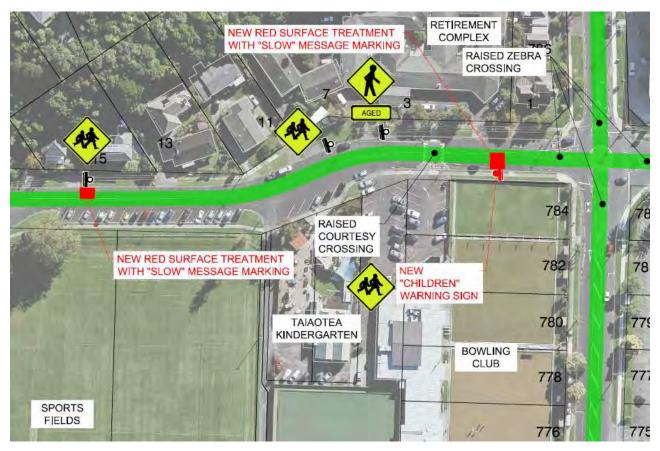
Taiaotea Kindergarten Proposed Facilities
